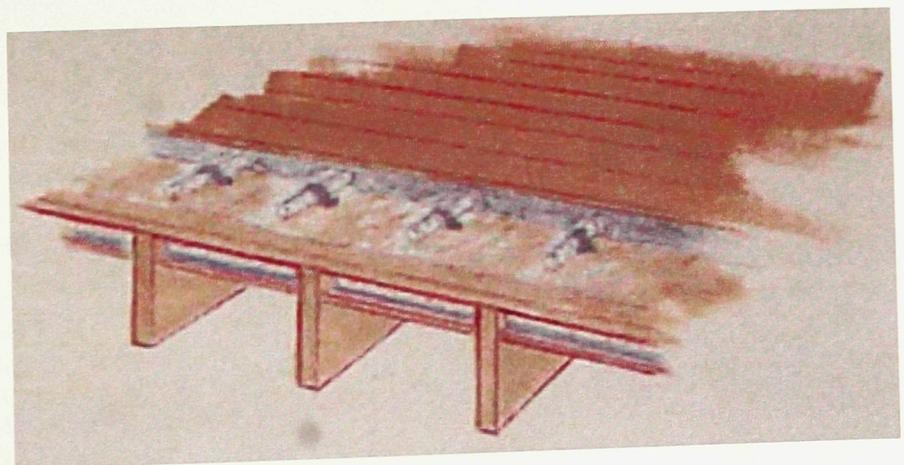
Radiant Floor Heating Coils and sub-floor insulation panels
